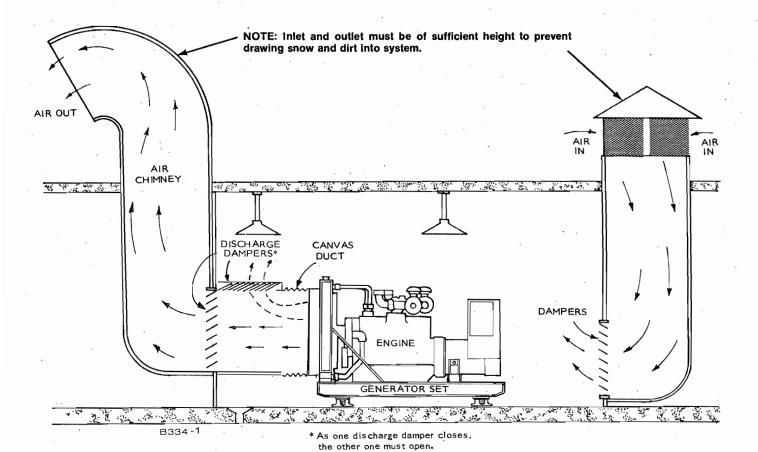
TYPICAL DUCT INSTALLATION WITH TWO DISCHARGE DAMPERS FOR RECIRCULATING AIRFLOW
